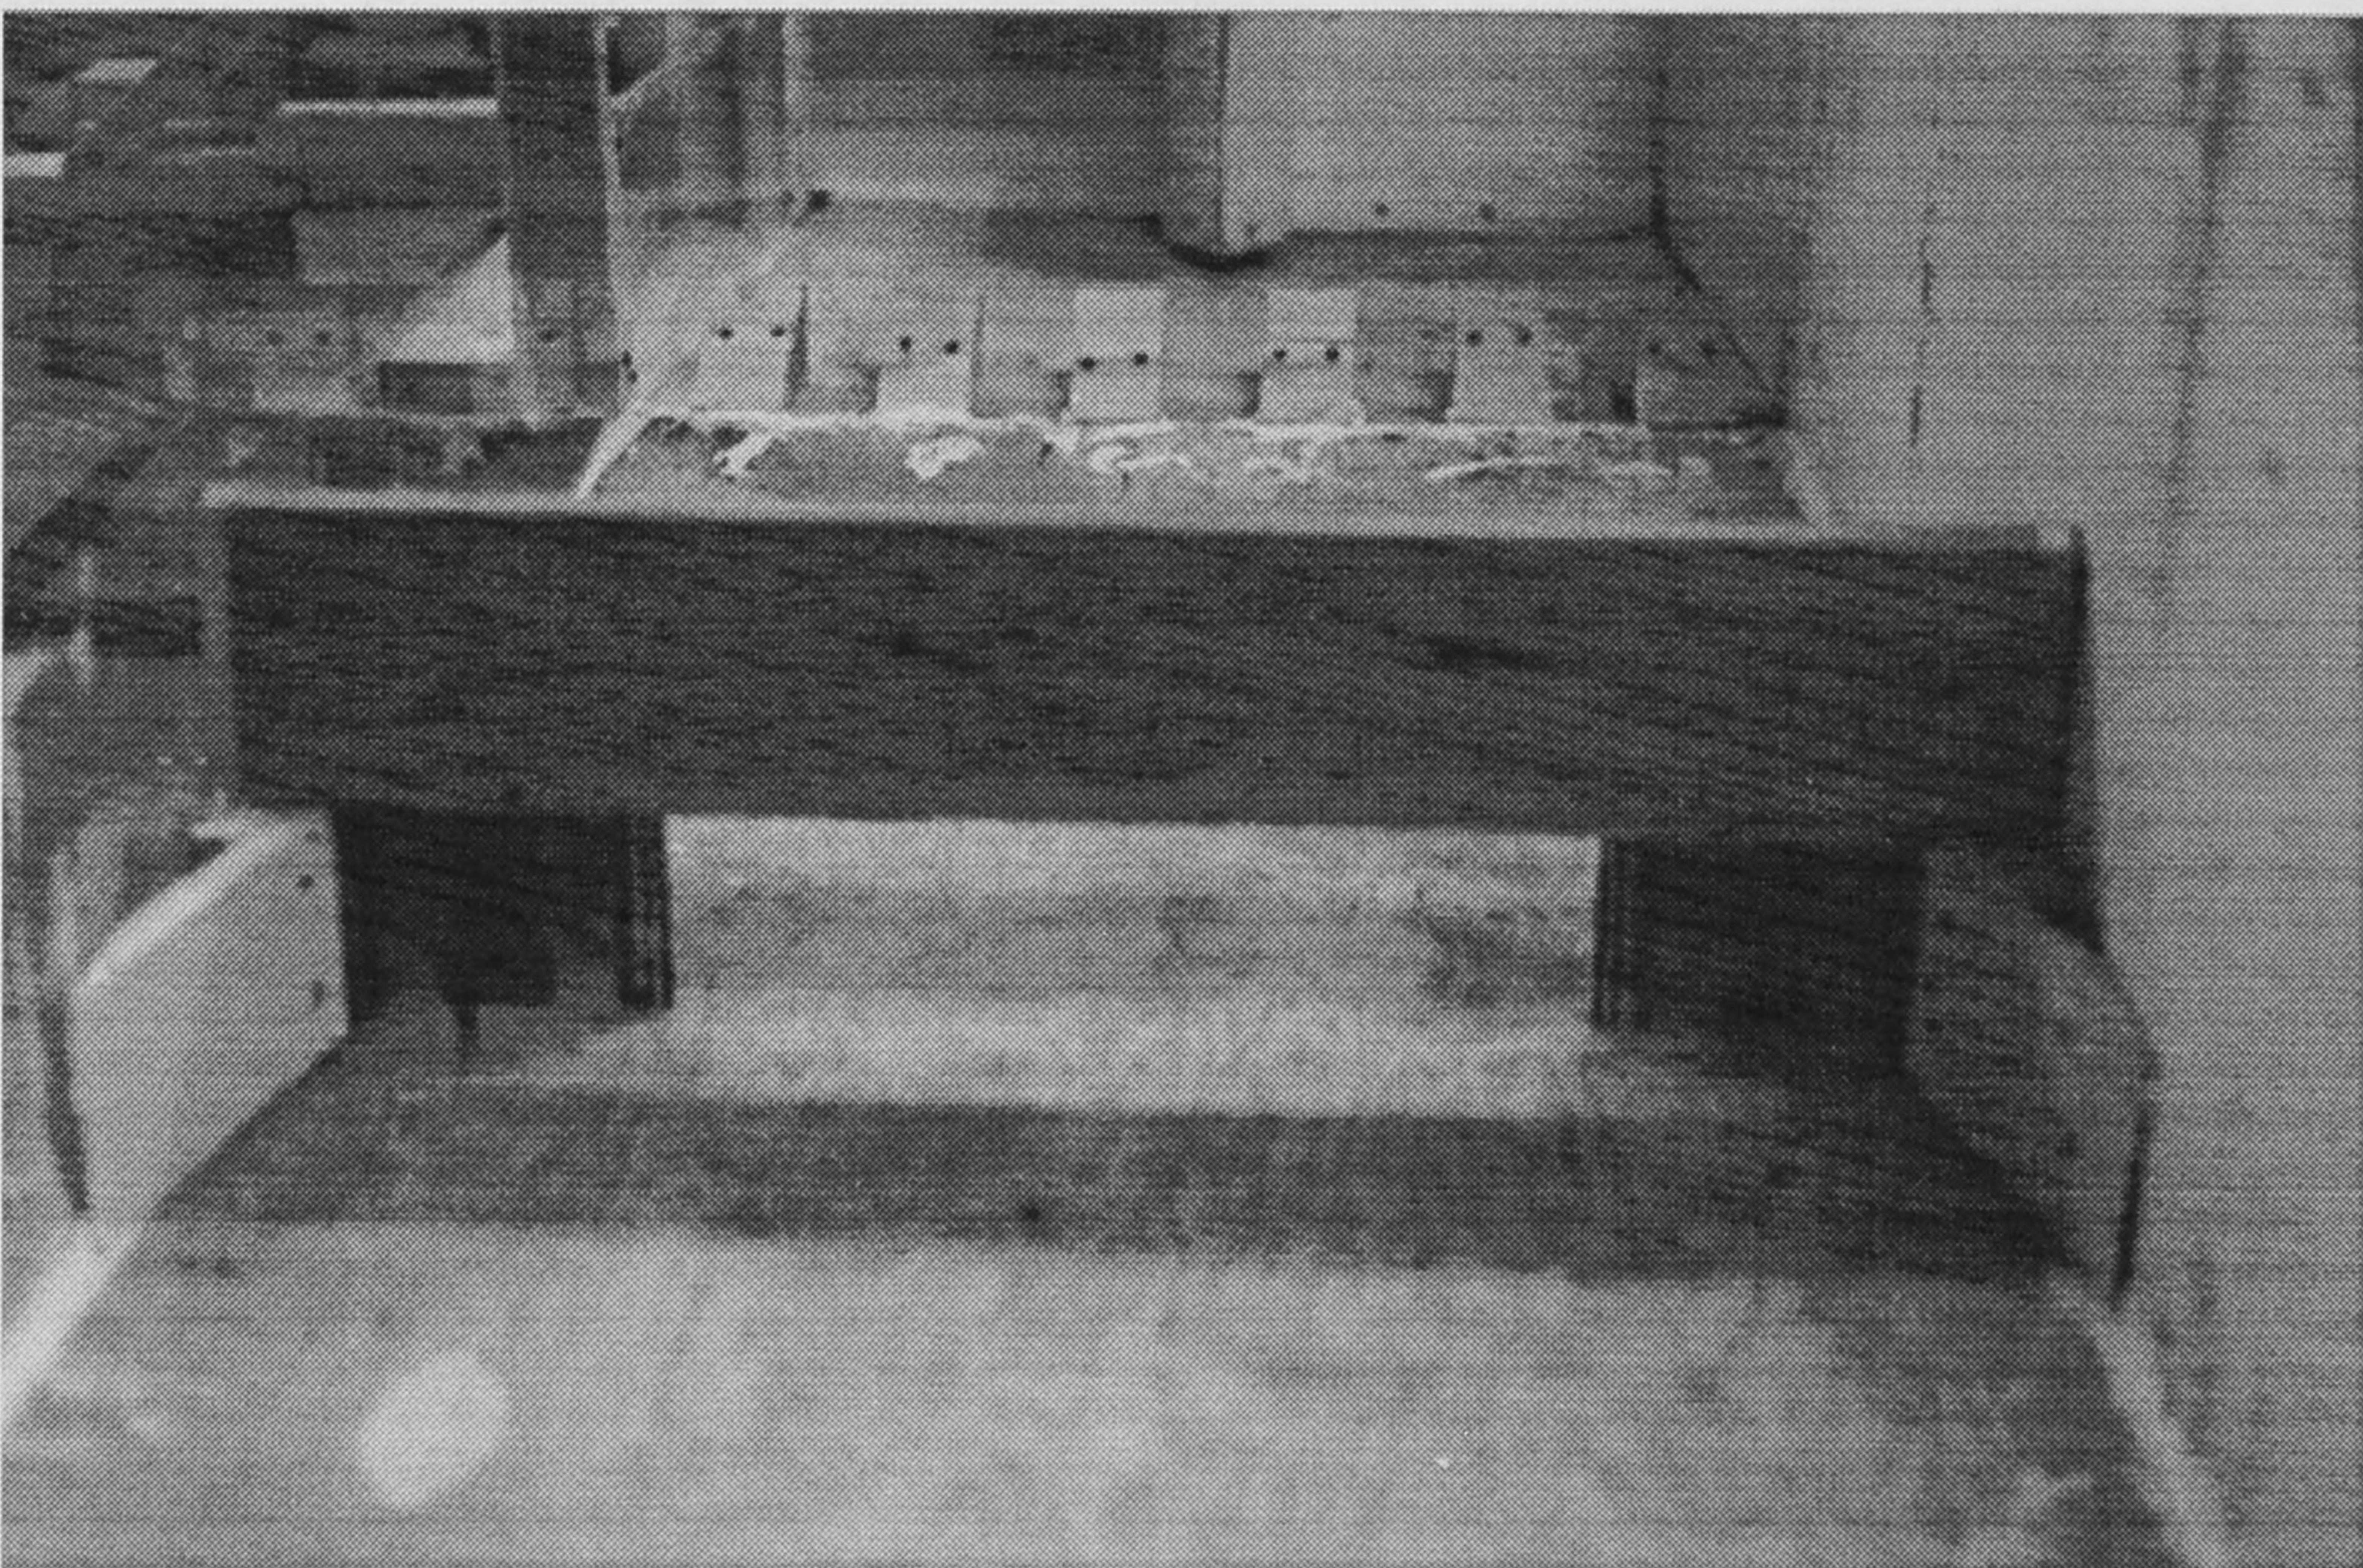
Decreased 8 foot width of the downstream baffle wall.
